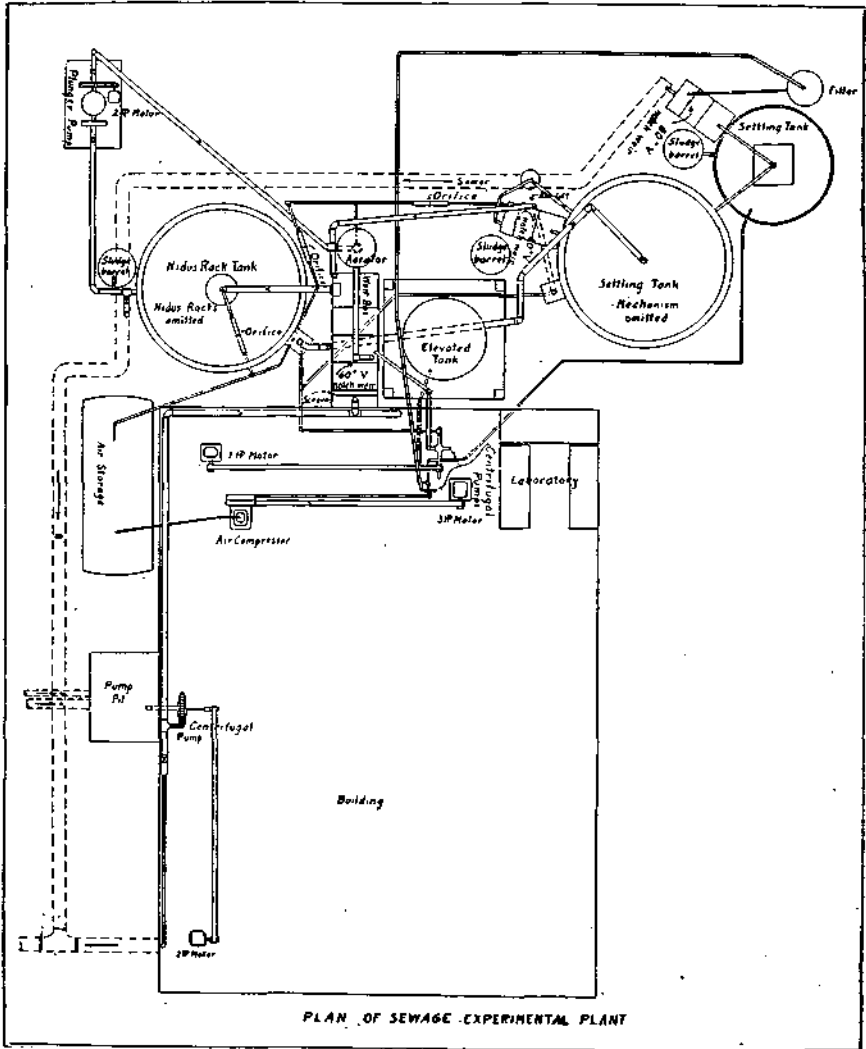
LAYOUT OF EXPERIMENTAL SEWAGE-TREATMENT PLANT, 1924.
